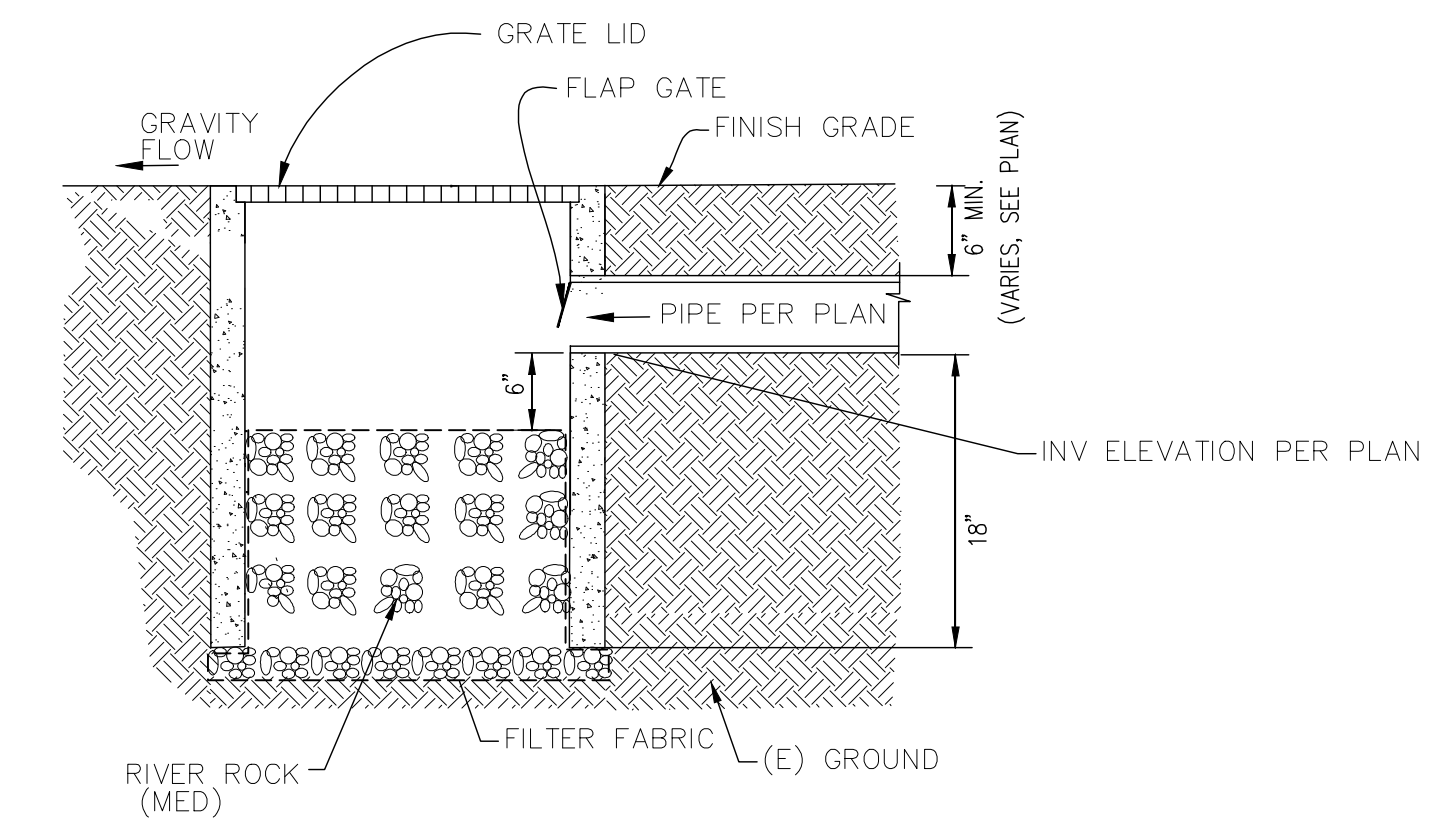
, SDJB & DETENTION PIPE CONNECTION
